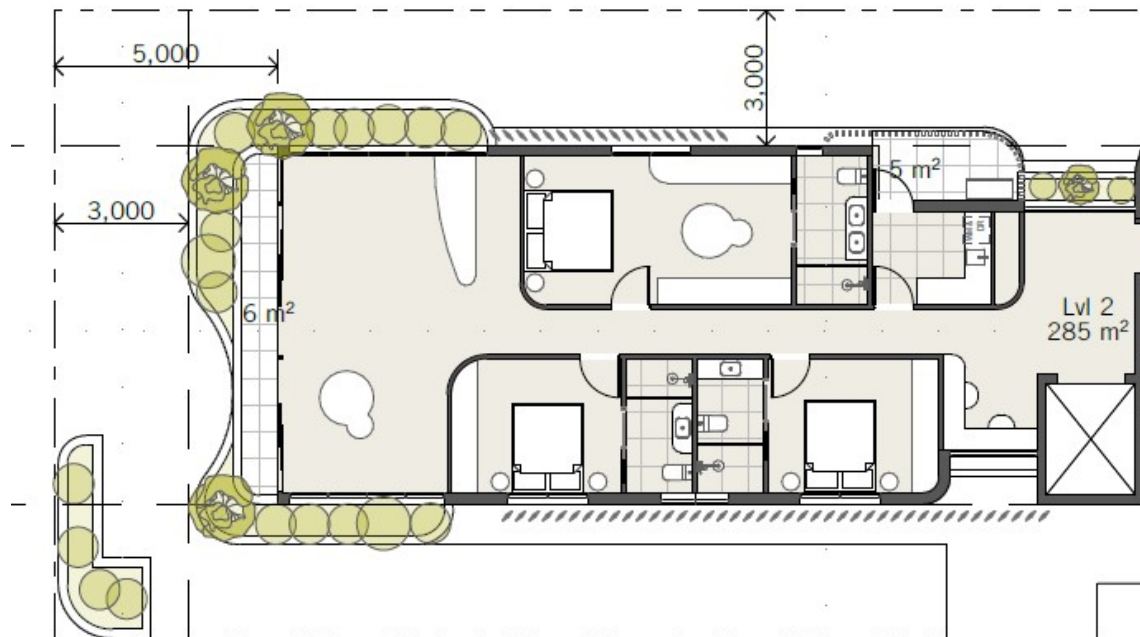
Partial level 2 floor plan (Source: Lightwave Architecture)
